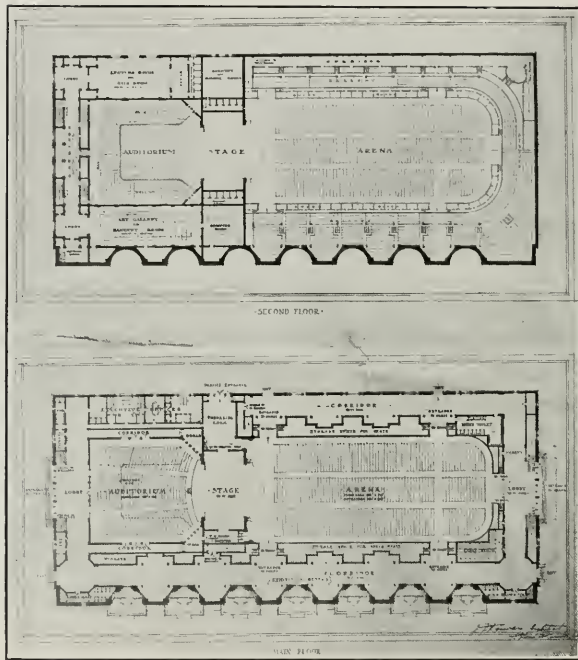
FIRST AND SECOND FLOOR PLANS, OAKLAND AUDITORIUM
